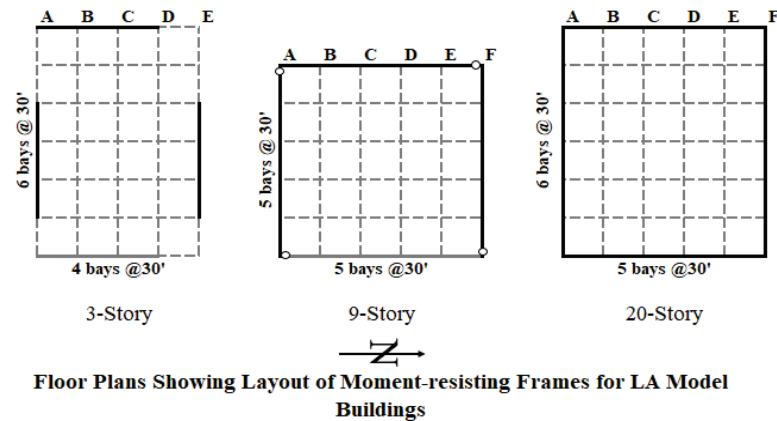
Baseline SDC D_{max} steel moment frame building plans.
